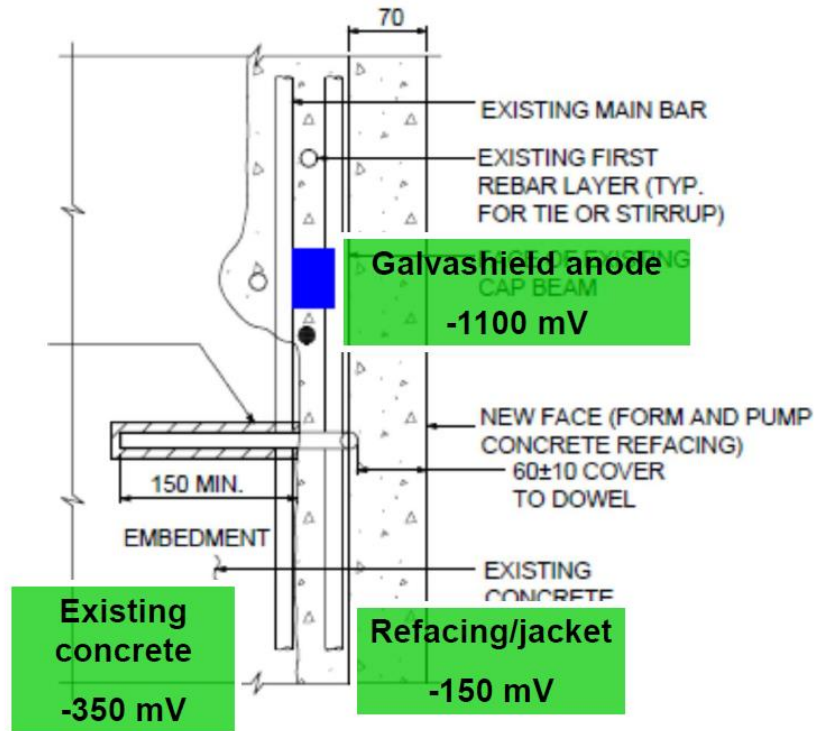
Galvanic anodes in column jacket/ abutment refacing/ deck overlay to control on-going corrosion
